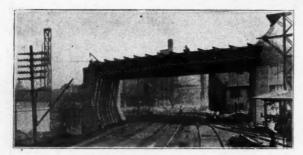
Plate Girder with 110 Ft. Span, Ludlow Avenue Viaduct.
